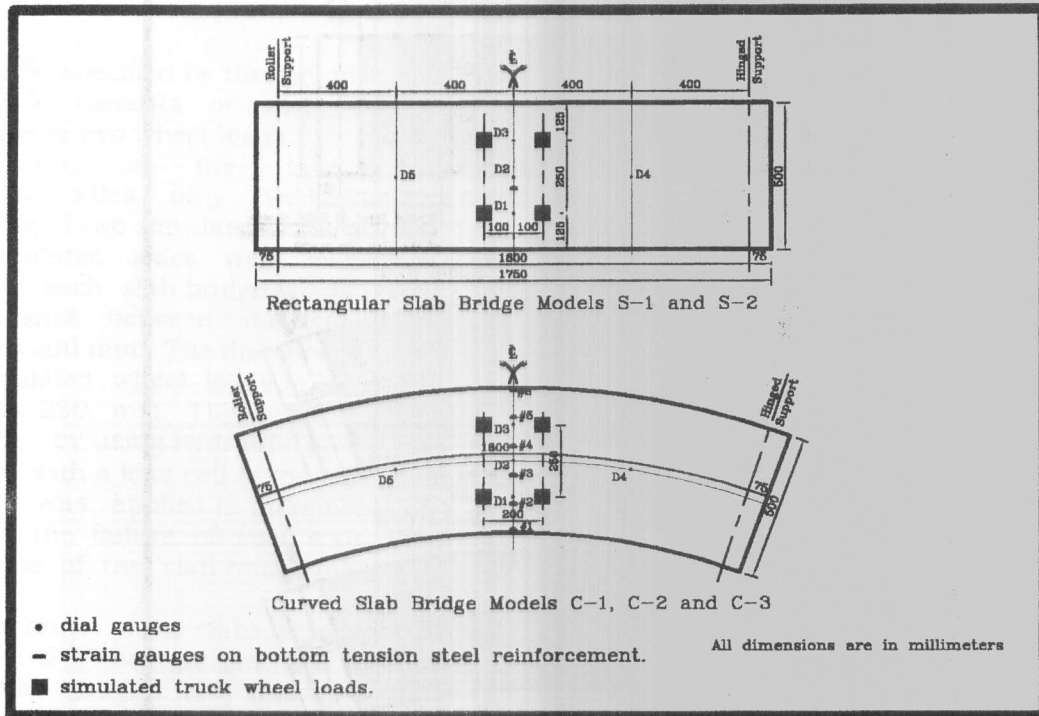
Dimensions, locations of dial gauges and strain gauges, and loading arrangement for tested slab bridge models.
